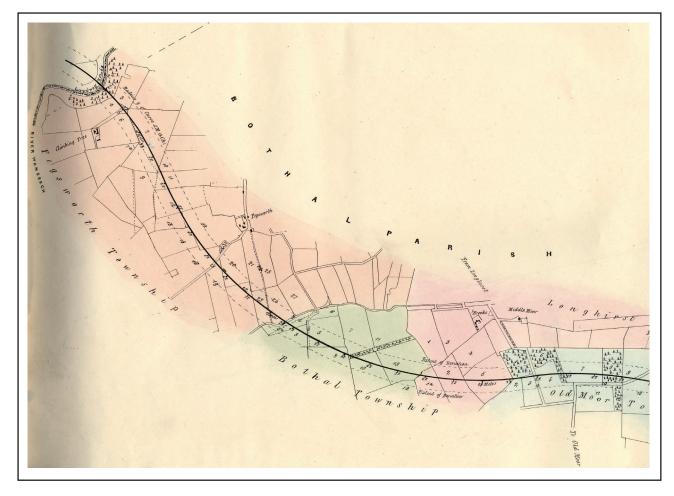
Plan of the Newcastle & Berwick Railway Plan, 1844
